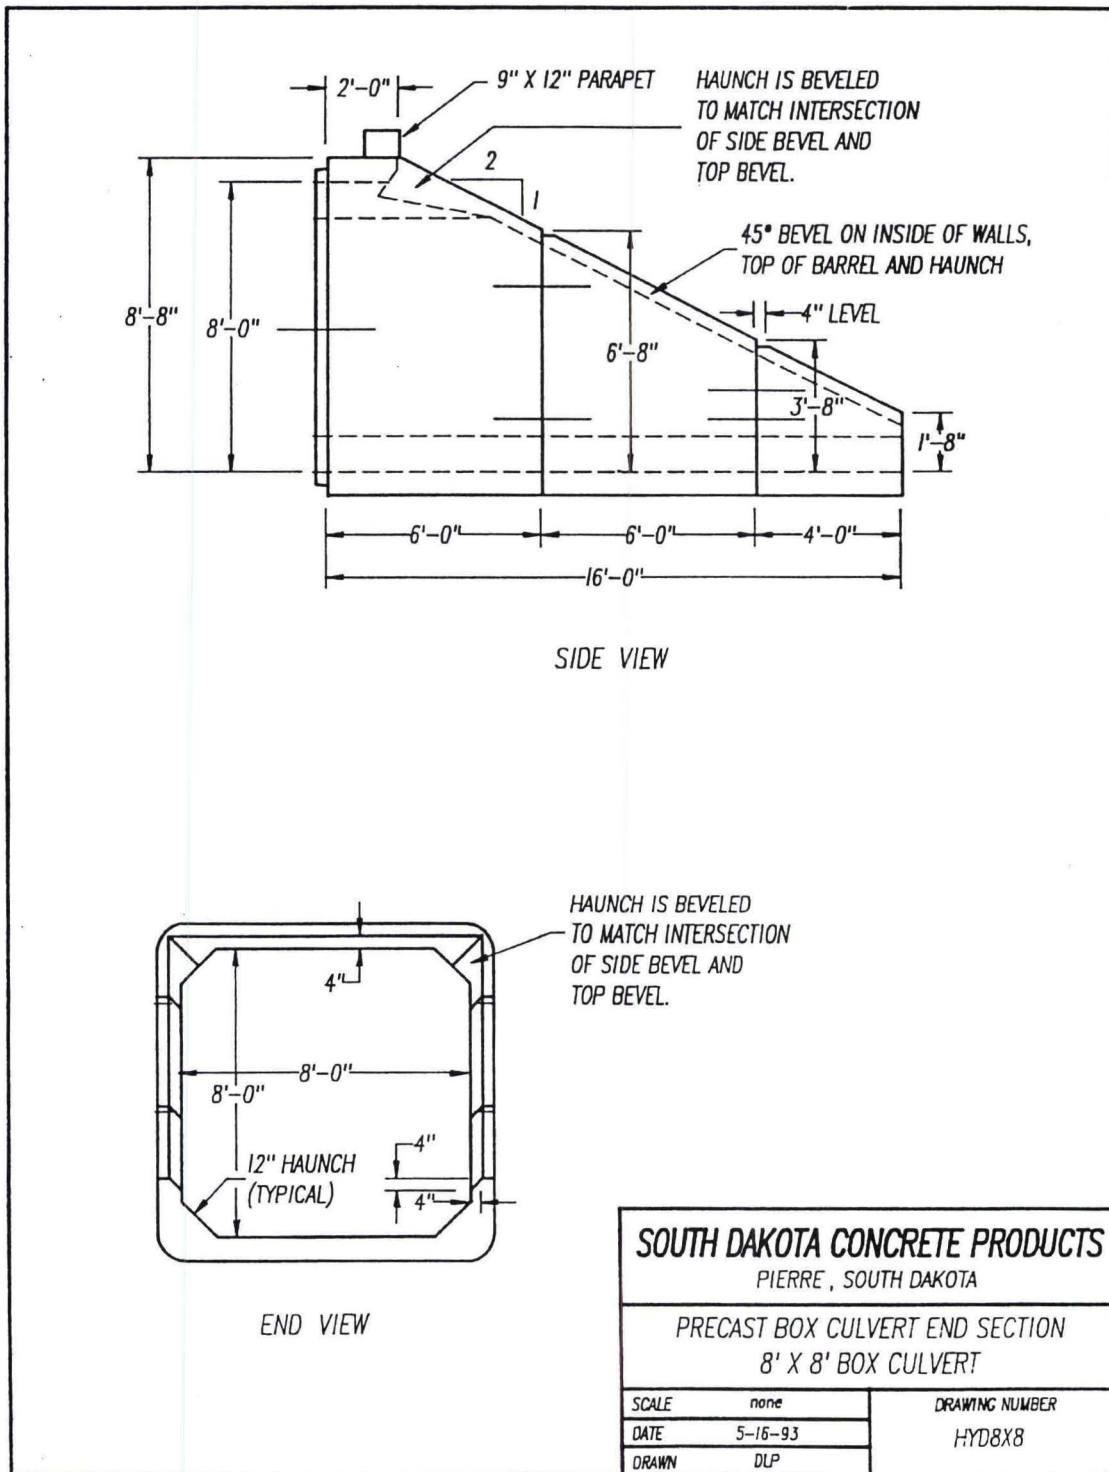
Schematic of the South Dakota precast culvert end section, 8 ft x 8 ft box.
